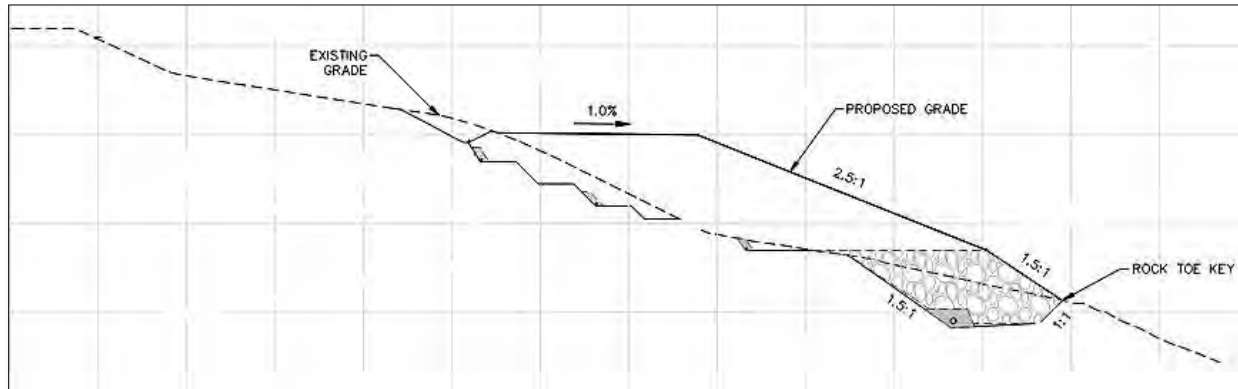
Cross Section - Stability Berm with Toe Key [34]
